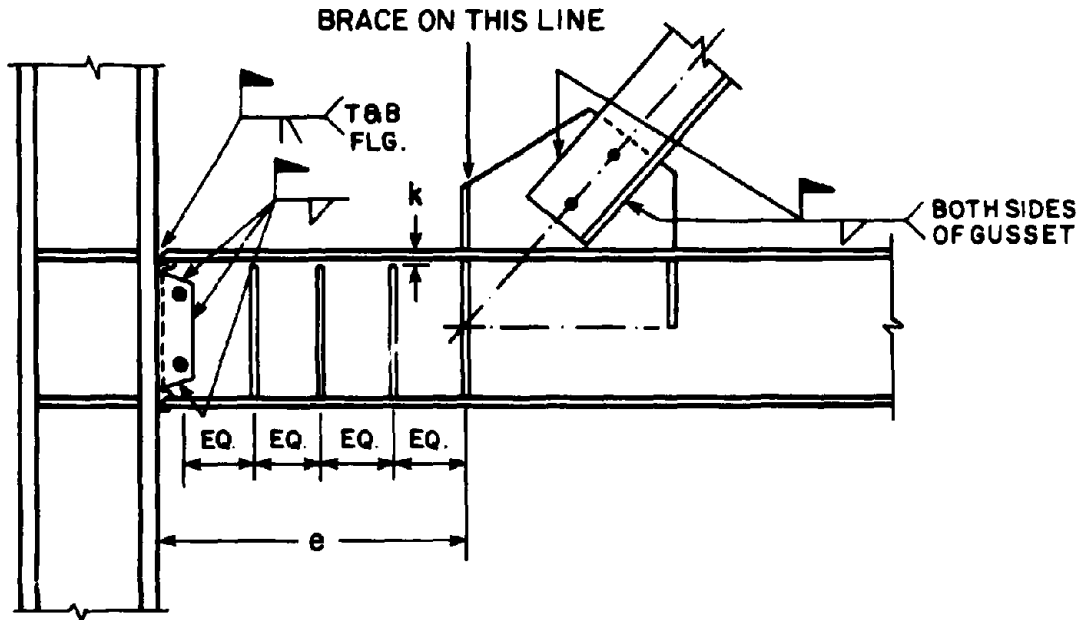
All-Welded Link-Column Flange Connection with Fillet Welded Web Showing Suggested Stiffener Spacing.
